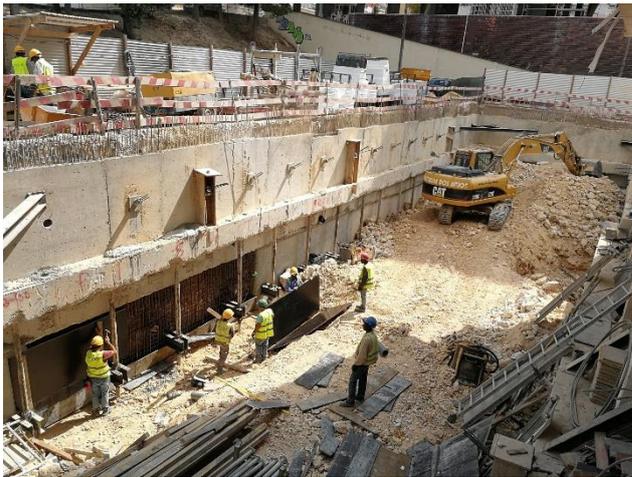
Execution of the formwork for the concreting and the HEB profiles used to shore the retaining wall corners.
